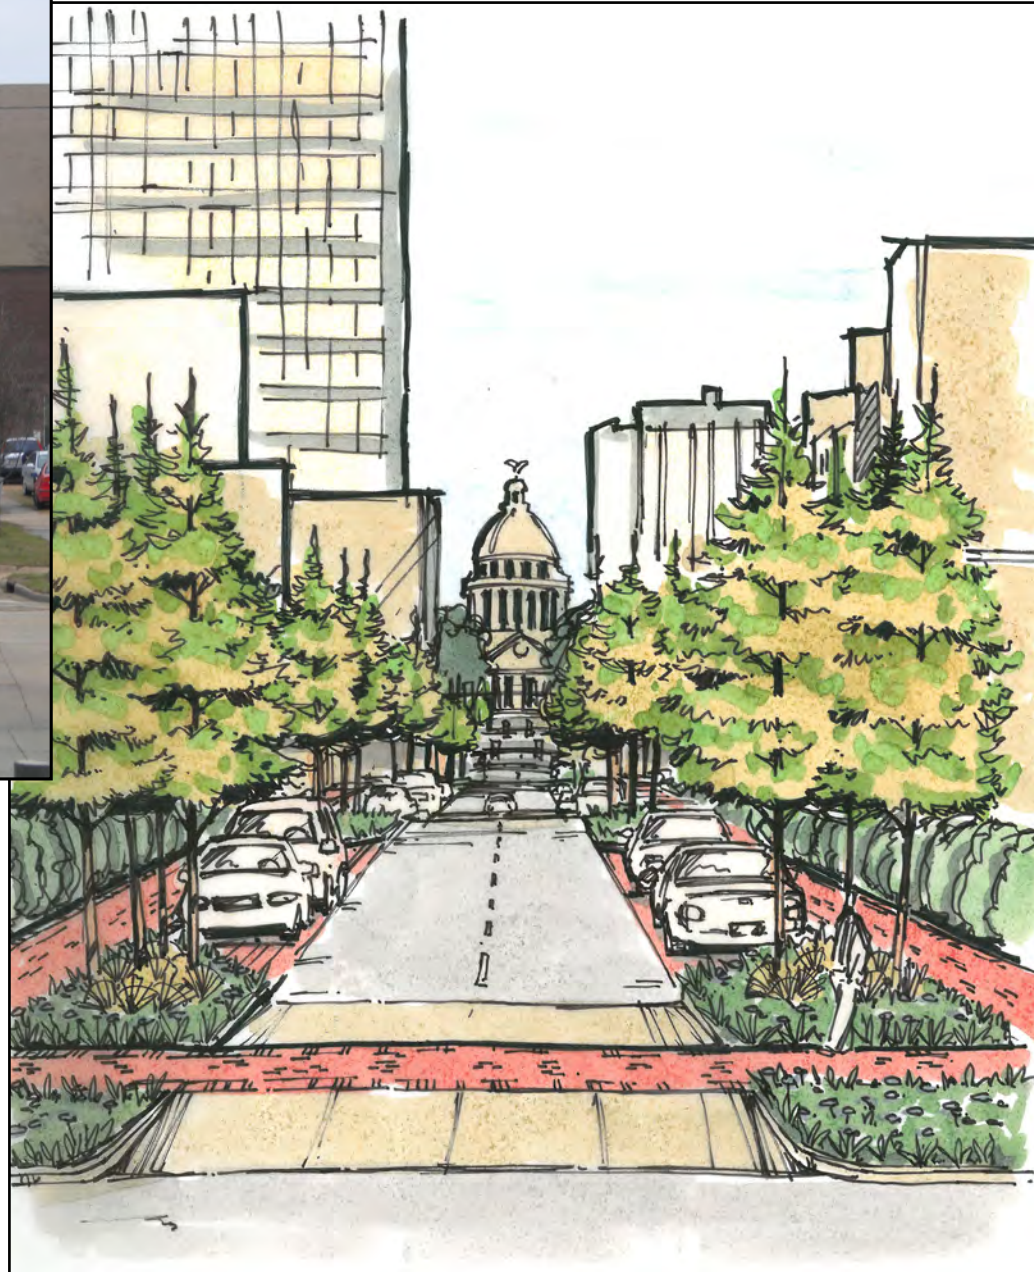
Sketch showing rain gardens at bump-outs, two-way vehicular traffic, and raised pedestrian crosswalks.
